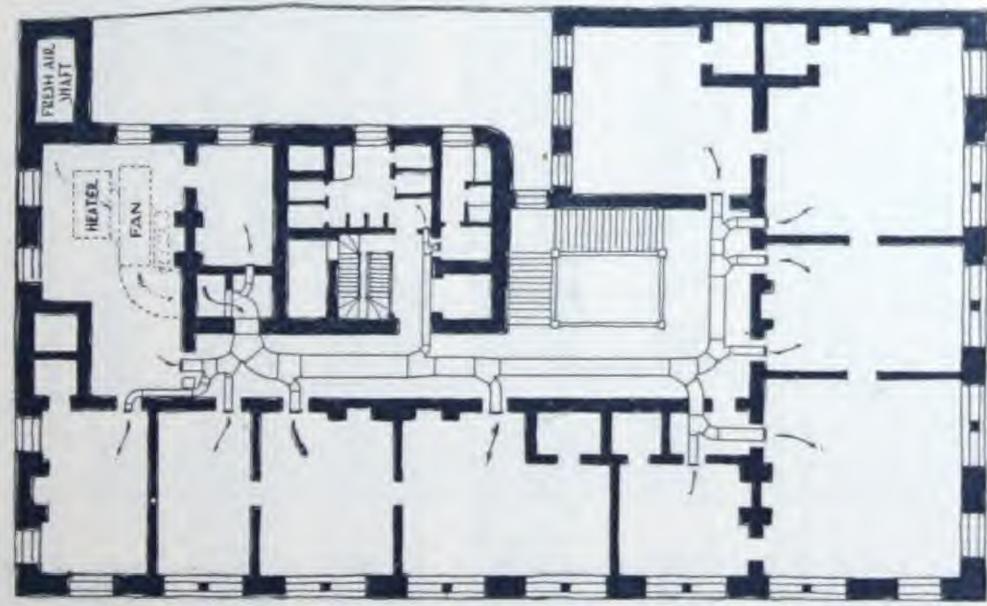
AMERICAN BELL TELEPHONE CO., BOSTON, MASS., THIRD FLOOR PLAN.
